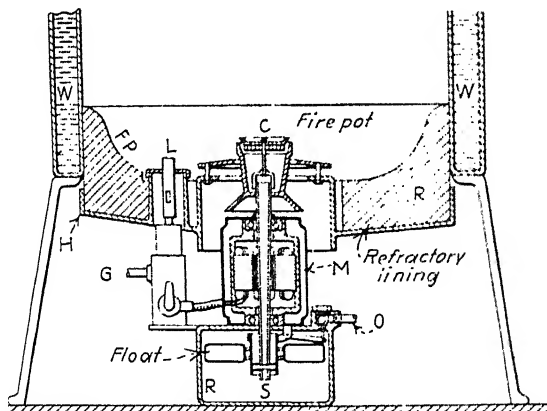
Vertical-shaft oil burner with auxiliary equipment.
